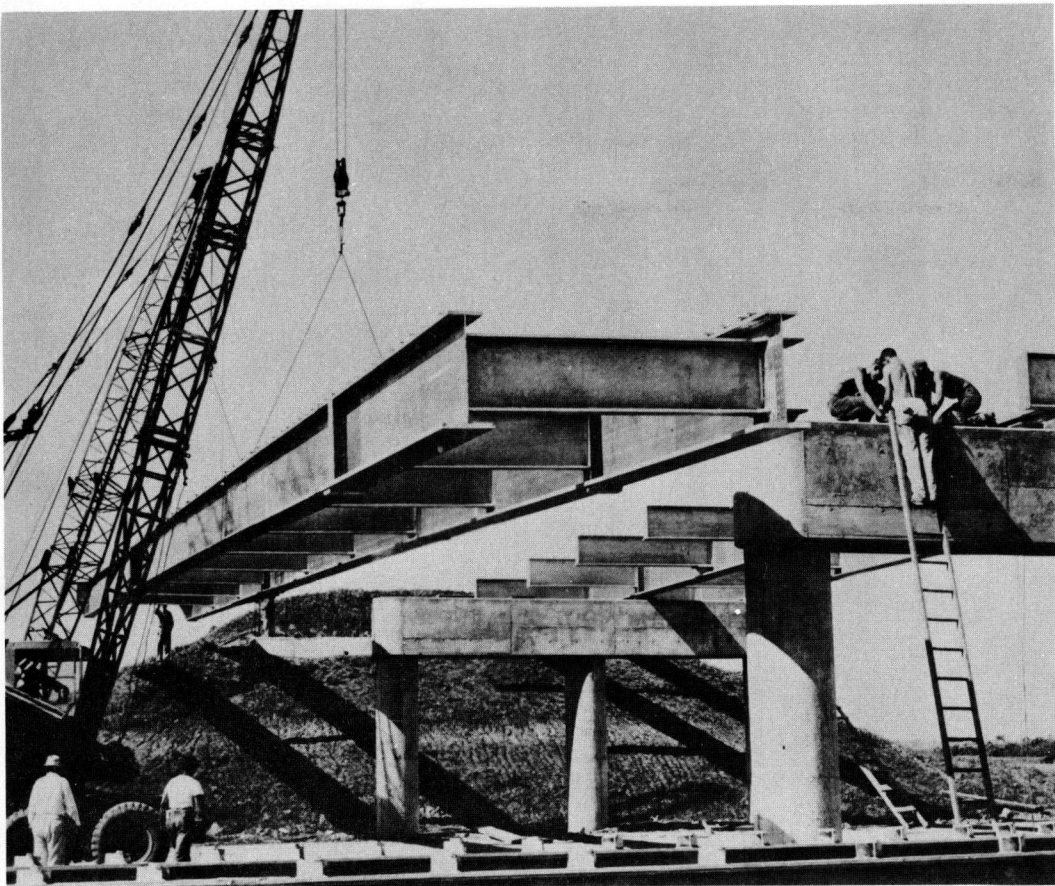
Giant subassembly of aluminum structural members elevated into position during construction of first aluminum girder-type highway bridge in the world, located near Des Moines, Iowa. Quick and easy field erection made possible by prefabrication of relatively lightweight members. Pioneering project jointly sponsored by Iowa State Highway Commission and Aluminum Company of America, Kaiser Aluminum and Chemical Corporation, and Reynolds Metals Company.
